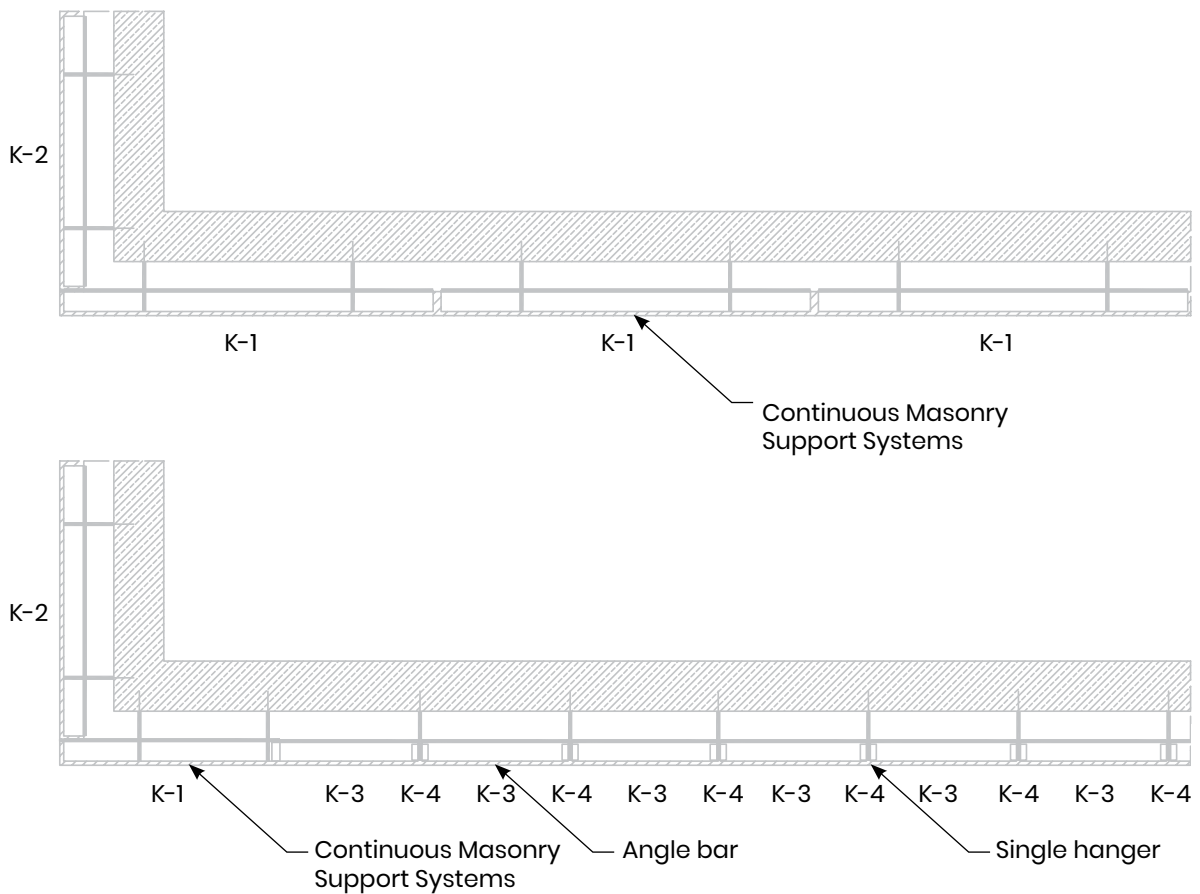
Sample Layout of Masonry Support Systems and Angles at the Corner of the Building
